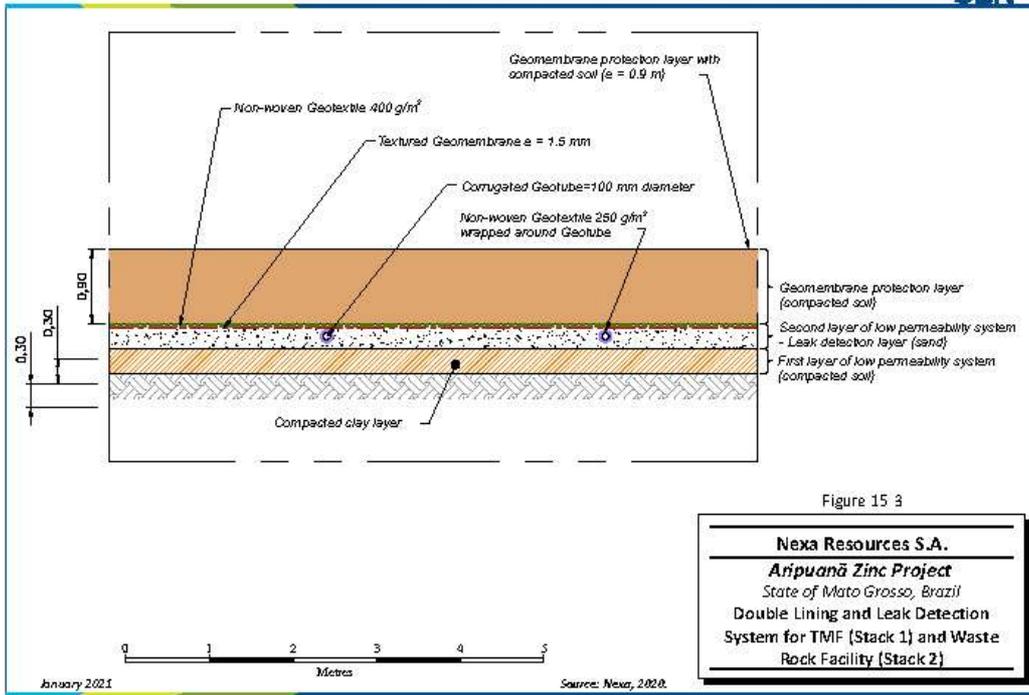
Double Lining and Leak Detection System for TMF (Stack 1) and Waste Rock Facility (Stack 2)
